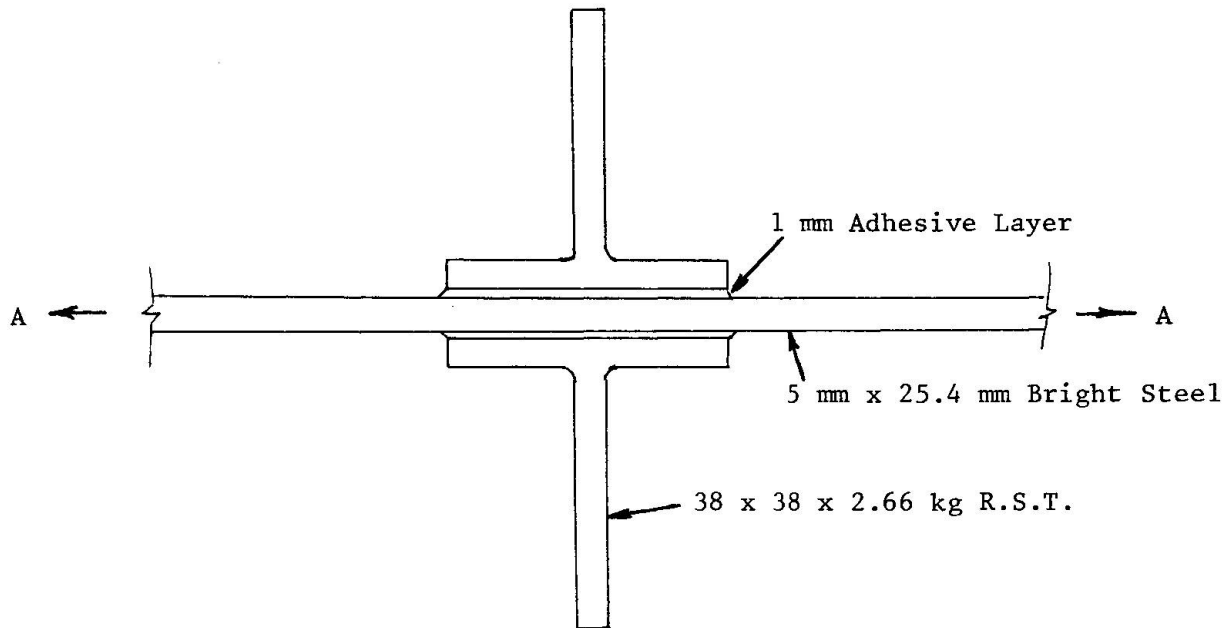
Test Specimen, Adhesive Bonded Unstressed T
